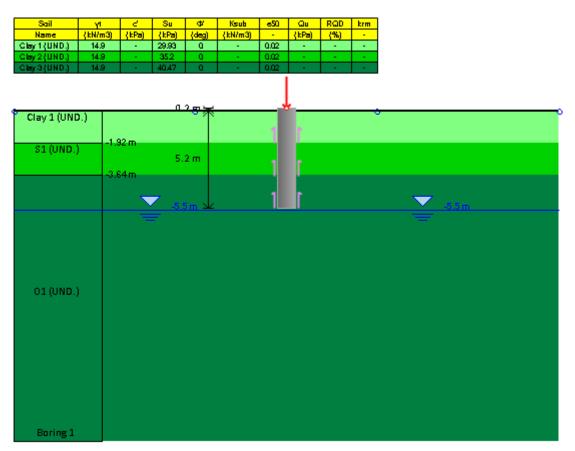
Assembly of pile foundation, Case study "1" Japan (1965)
